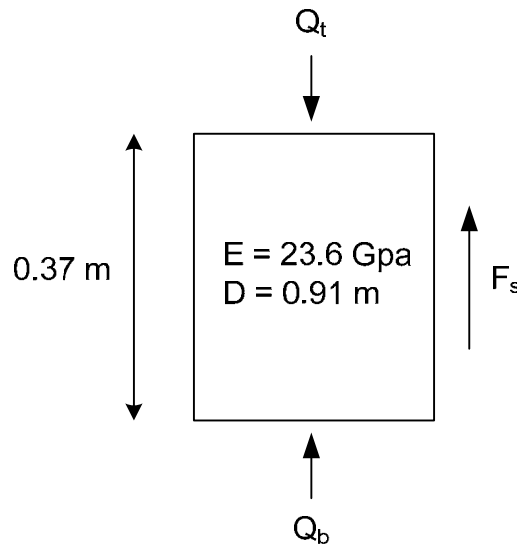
An element of drilled shafts used for load transfer analysis
